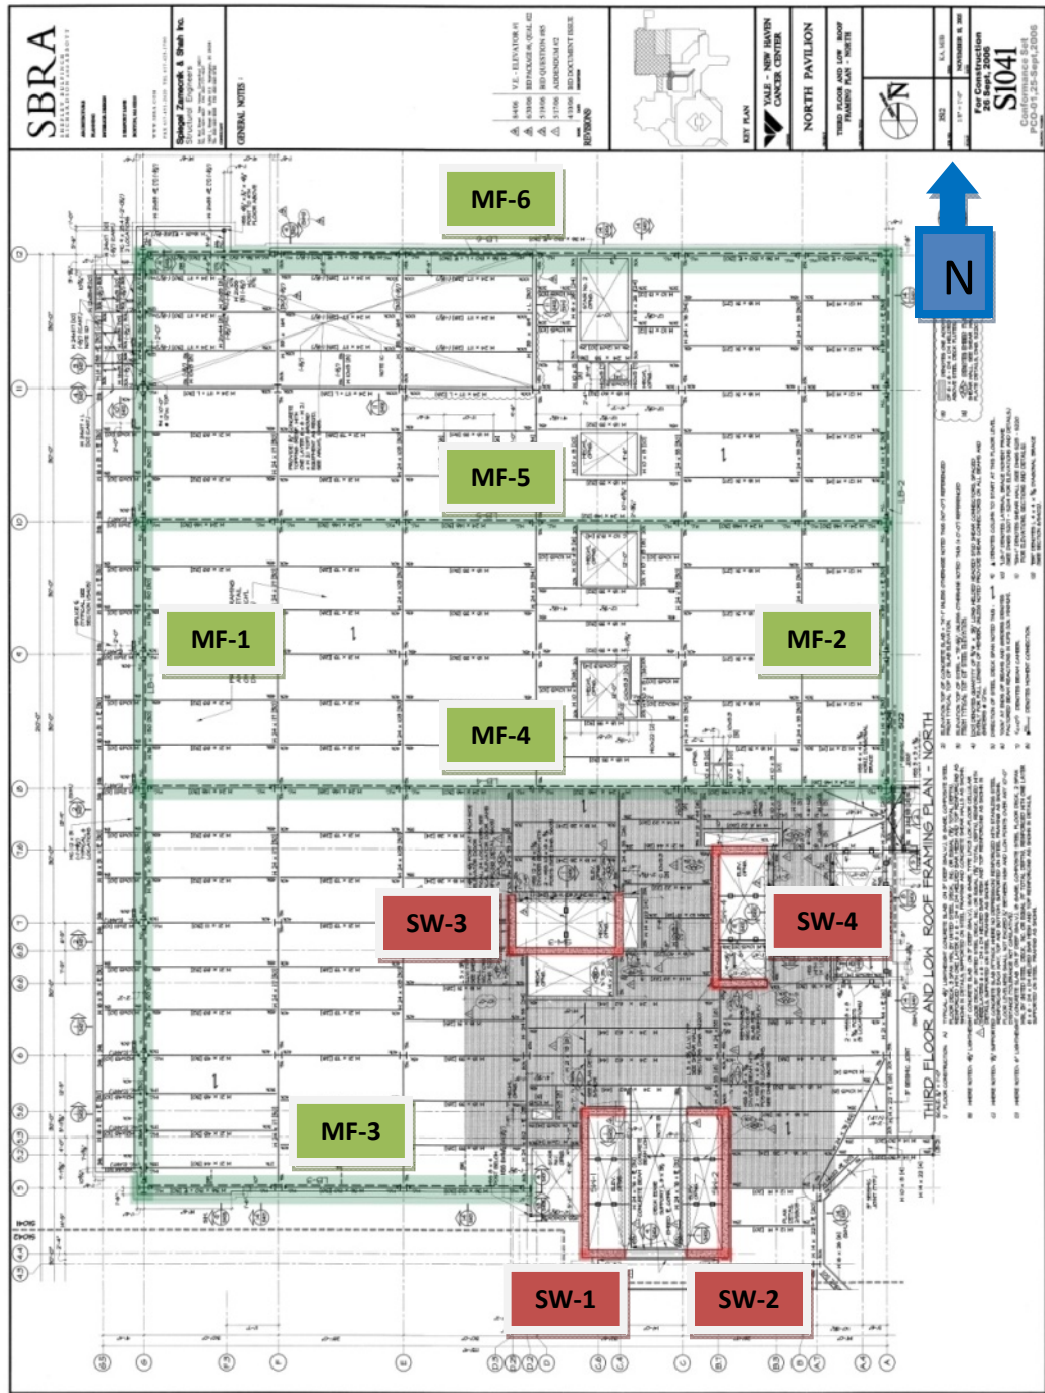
Typical Framing Plan for Levels 1-5. Green denotes Moment Frames; Red denotes Shear Walls
